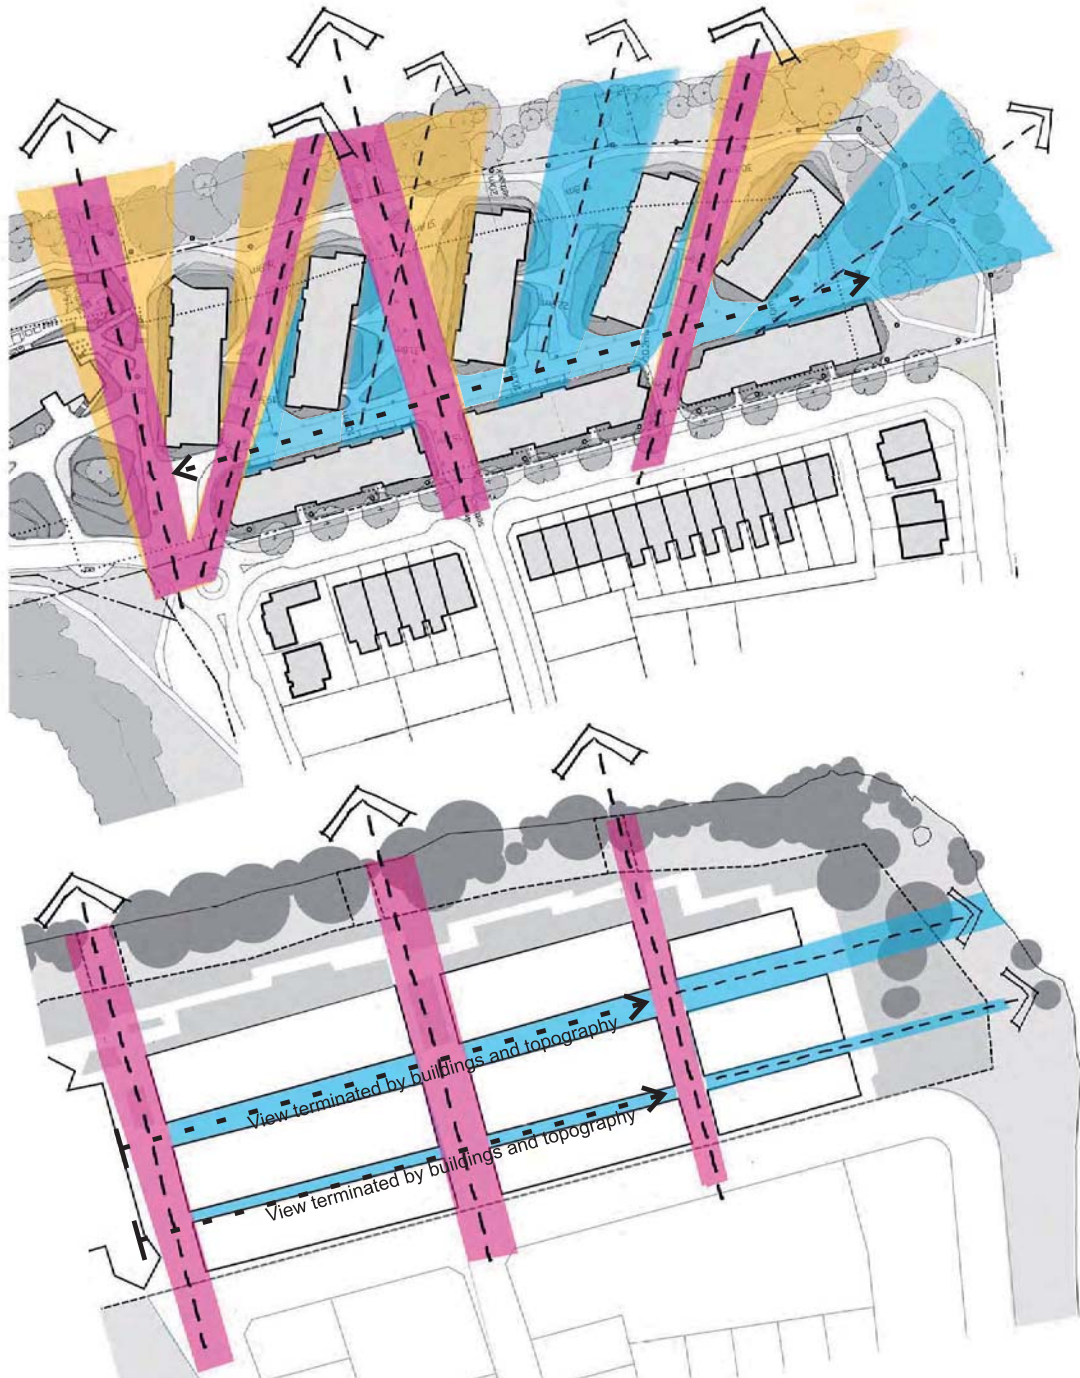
Site Vistas from Approved Concept Plan and Proposed MOD 5 Masterplan
